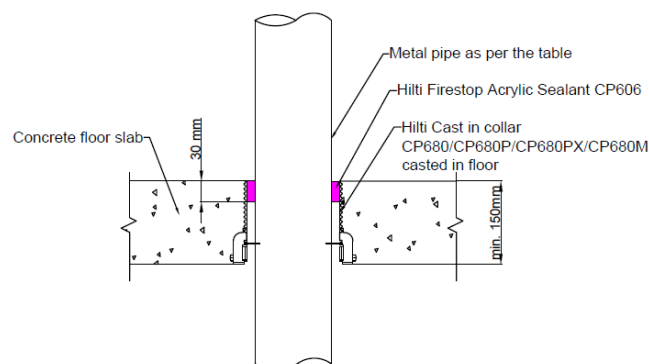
Side view – 120 mins FRL rigid floor with cast-in collar in concrete slab detail
